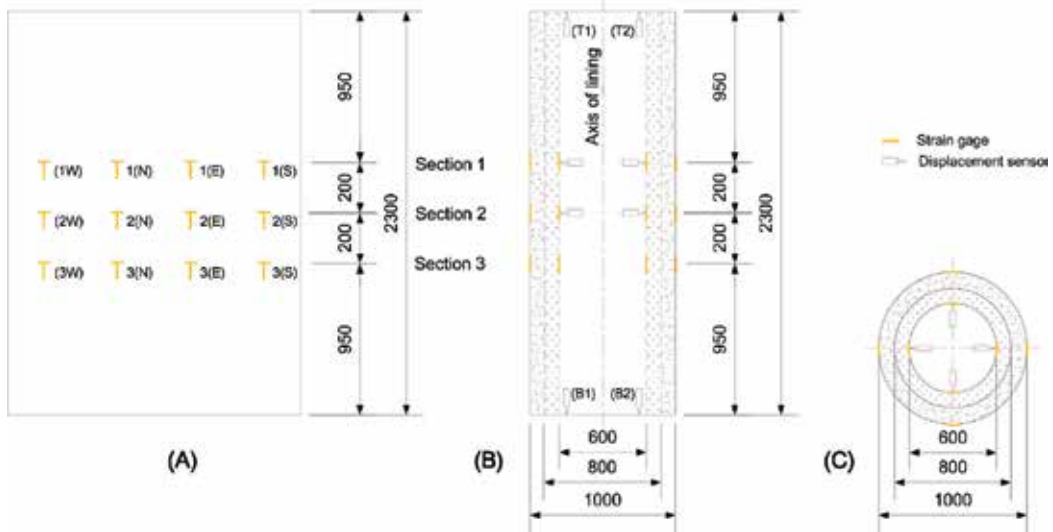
Layout of monitoring points (mm): (A) unfolded section; (B) vertical section; and (C) horizontal section.
